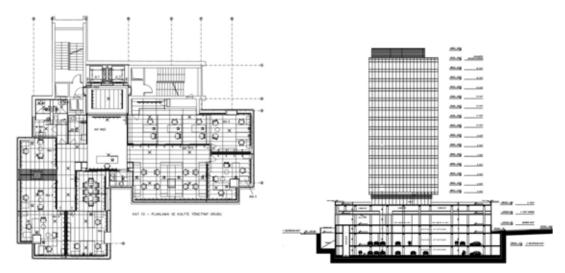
Typical Floor Plan and Section of GAMA Building
